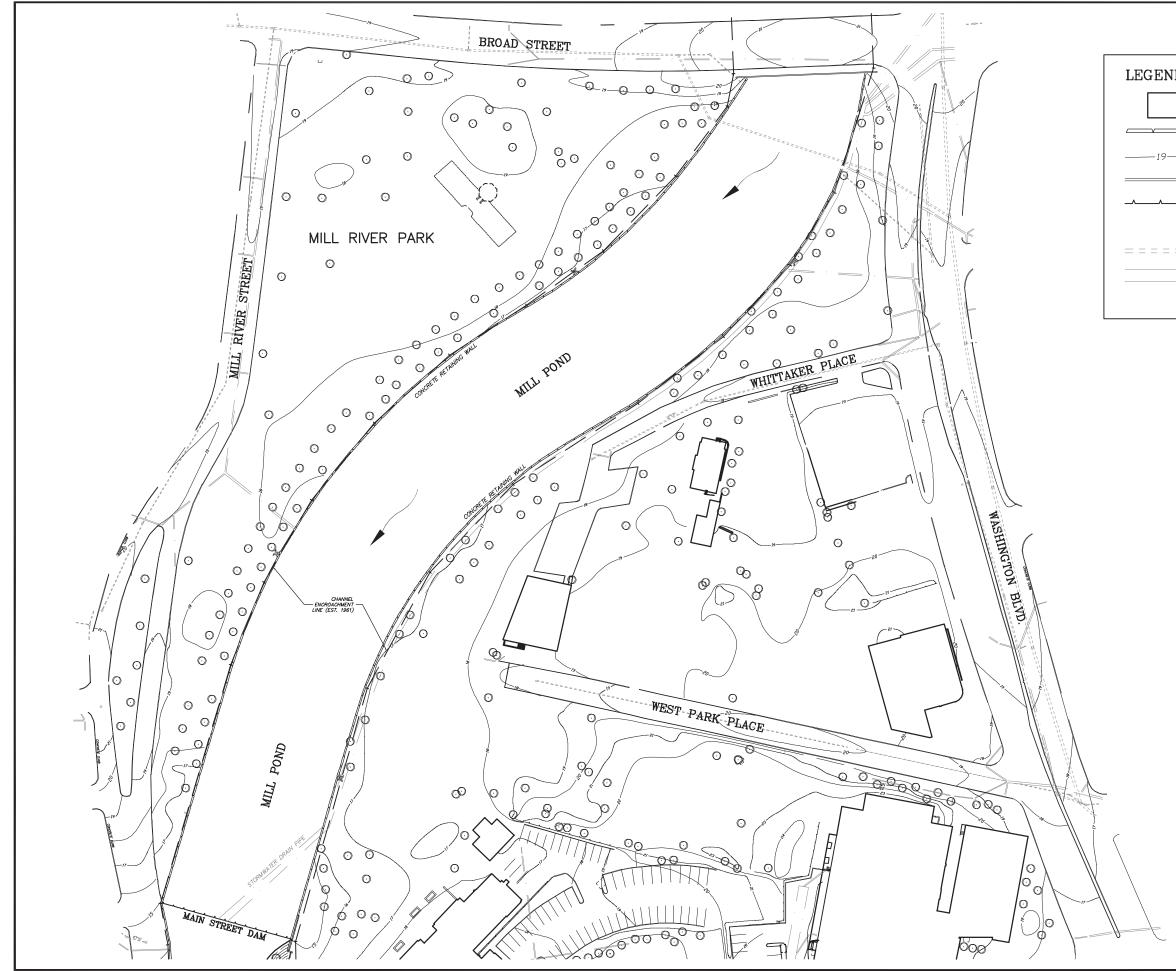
EXISTING SITE PLAN AND TOPOGRAPHIC SURVEY OF THE MILL RIVER PARK
